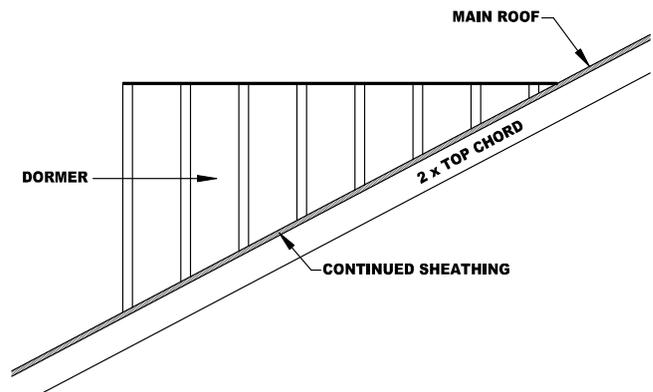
B: DORMER ENTIRELY OVER MAIN ROOF SHEATHING
